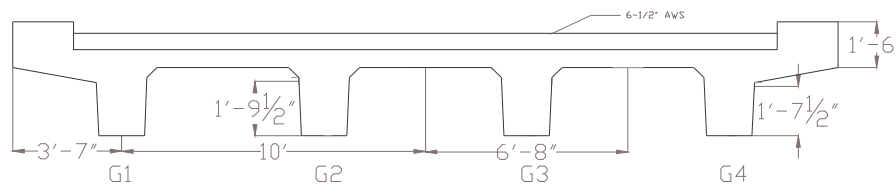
Typical cross-section of the superstructure for Bridge 59-361
